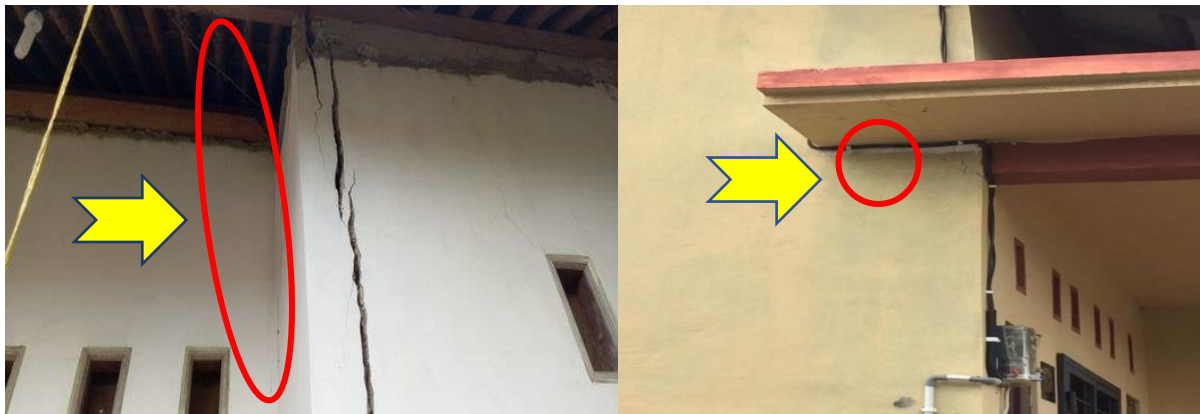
Cracked Walls and Beams in Borneo Sejahtera & Kecipir Indah Permai Resident
